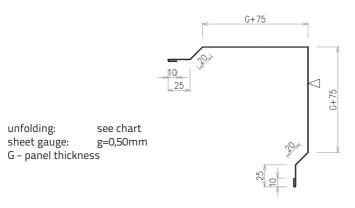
Ob-40 flashing "Starter for sandwich panels (type II)"
